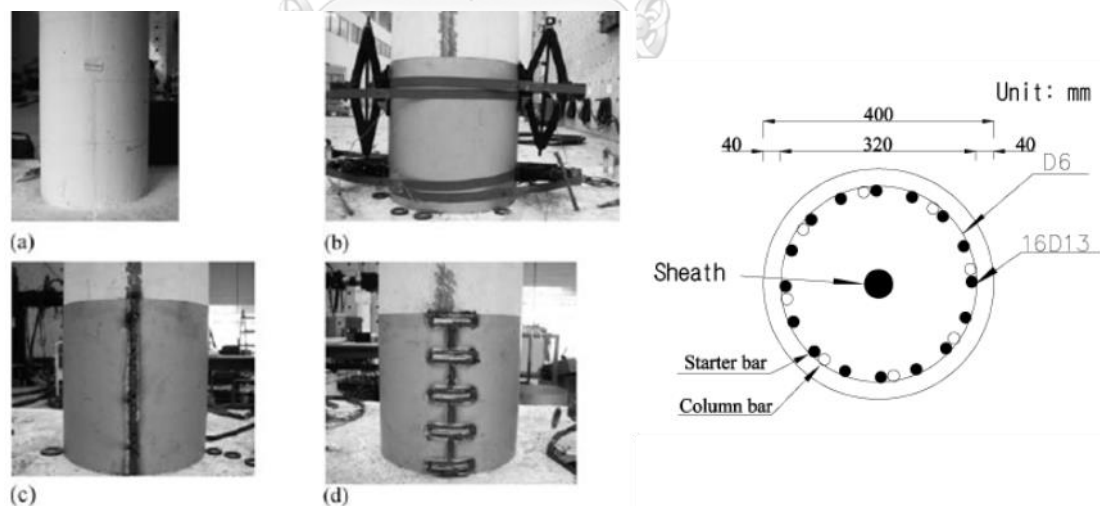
Jacketing procedures and cross-section of the column (a) As built column (b) Apply external pressure on steel jacket (c) Weld overlap line and (d) Weld lateral strip bands [29]
